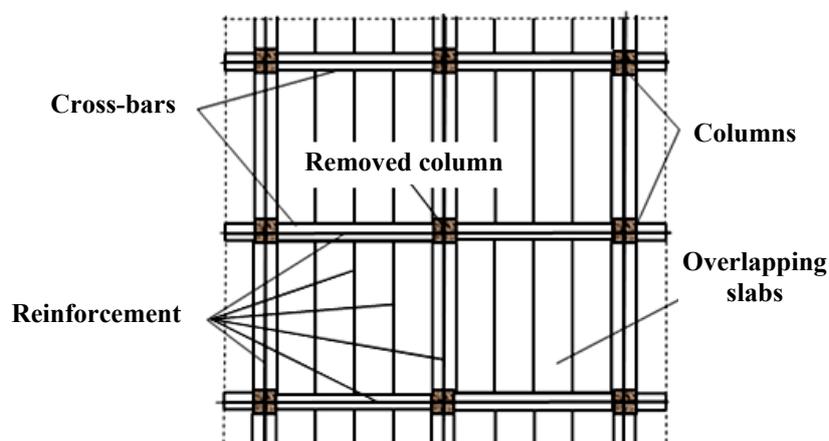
Construction scheme of the reinforced overlapping of a building with a braced framing
